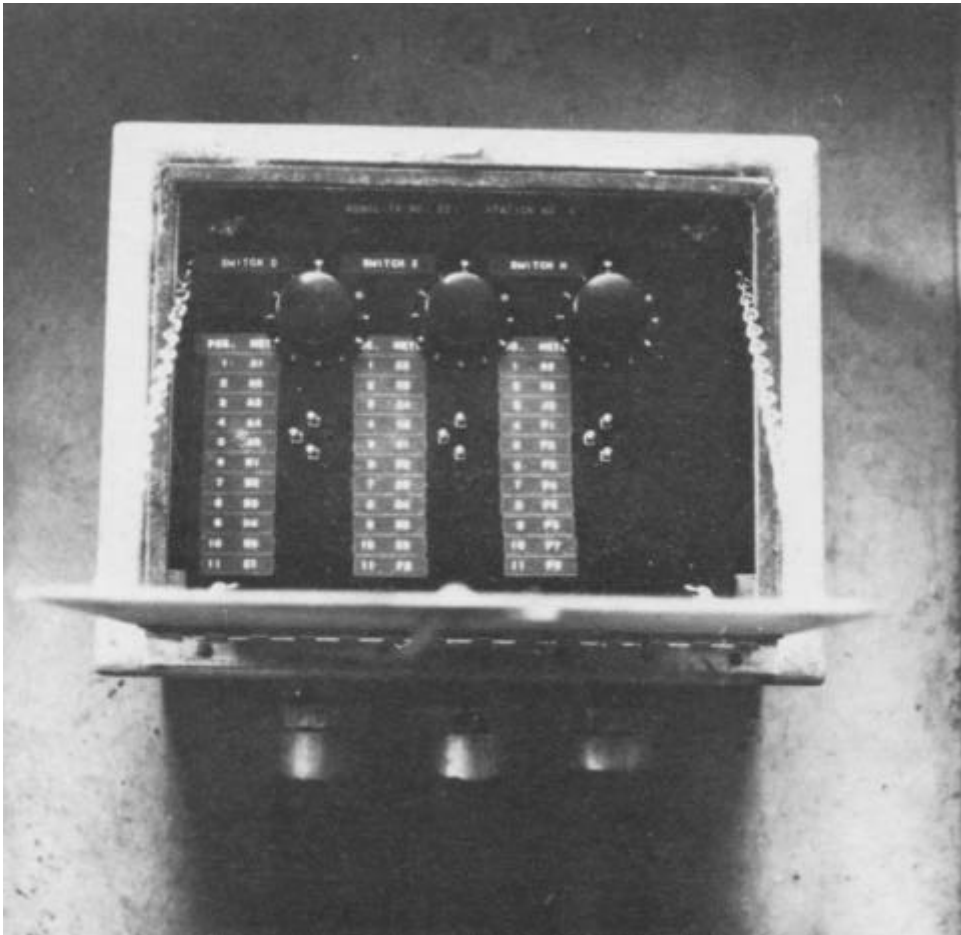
Surface-Mounted Terminal Station with Multiple Position Terminal Switches Showing Conduit Fed in from Bottom. (Photo by CE-WES)
